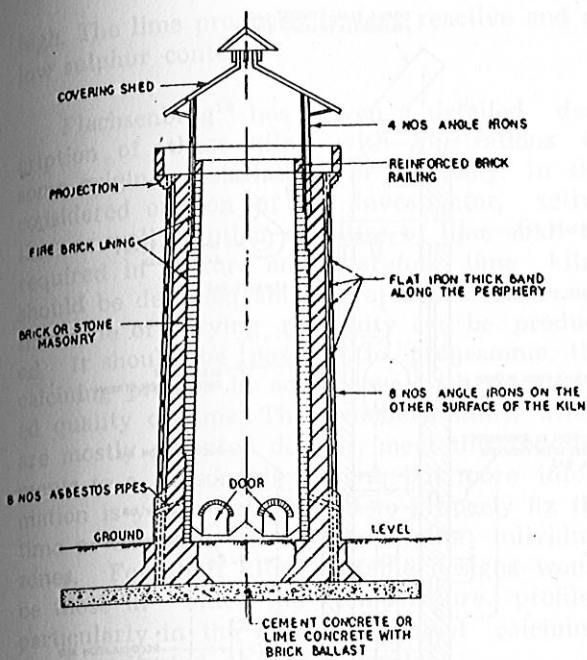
SECTIONAL ELEVATION OF A MASONRY LIME SHAFT KILN
